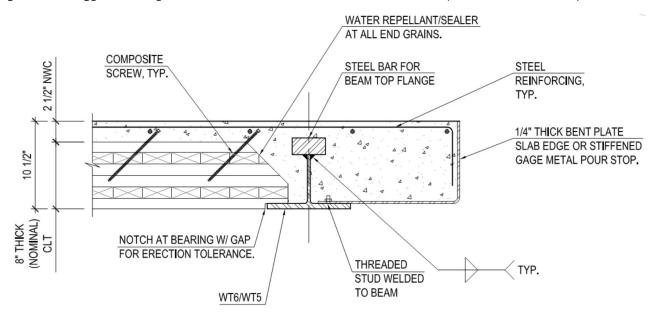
Typical Floor Connection detail at the edges (Credit: AISC, 2017)
